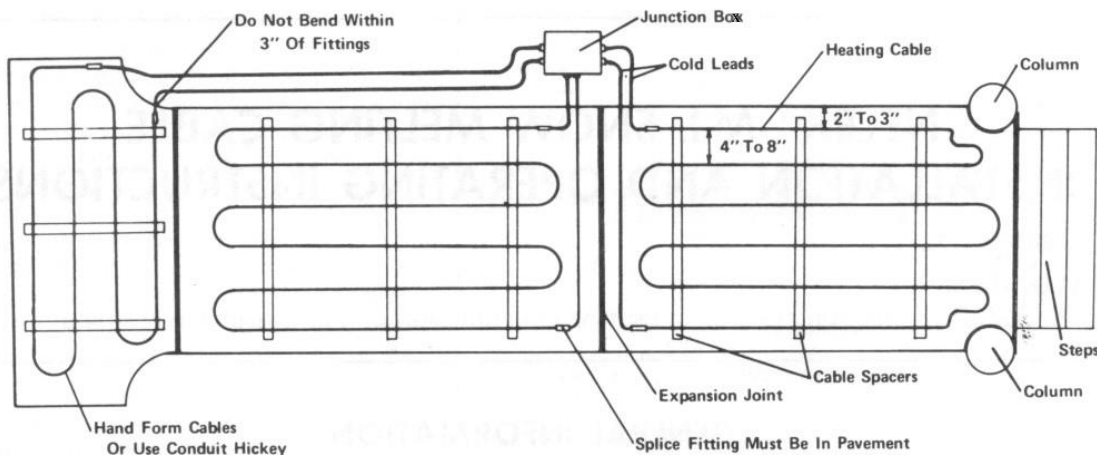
TYPICAL SNOW MELTING SYSTEM
